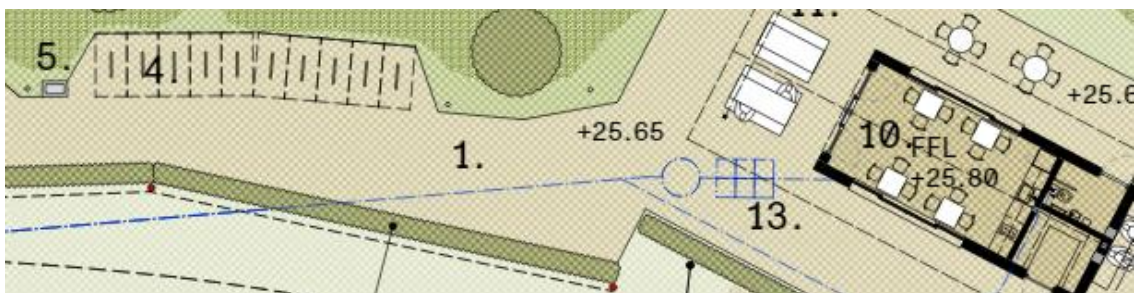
new proposed cycle spaces in proximity to the new pavilion
